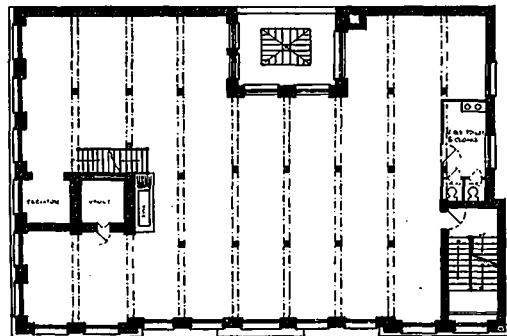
UPPER FLOOR PLAN, SHUTTLEWORTH BUILDING, TORONTO. R. J. EDWARDS & SAUNDERS, ARCHITECTS.
